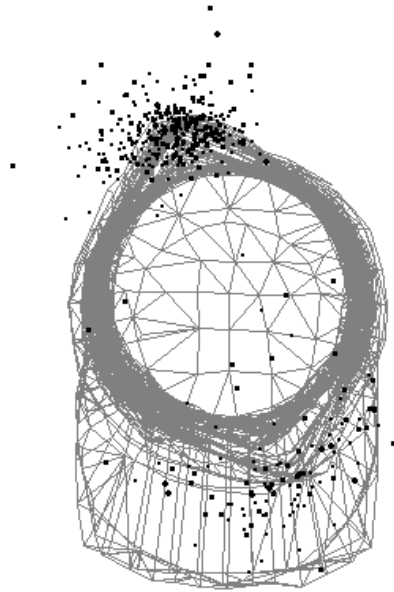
Development of a notch and roof and floor spalling shown by MS locations at the Mine-by tunnel at AECL's Underground Research Laboratory.
